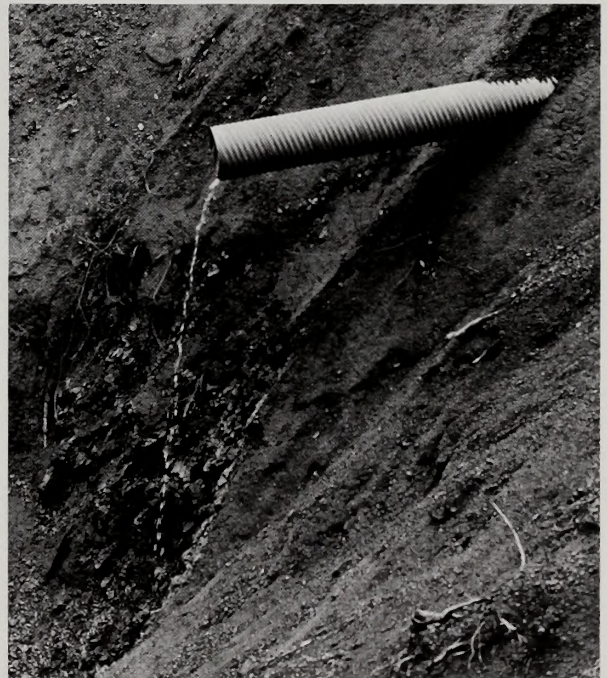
Weathered schists are easily eroded. Culverts should not discharge water onto unprotected fills and slopes.
